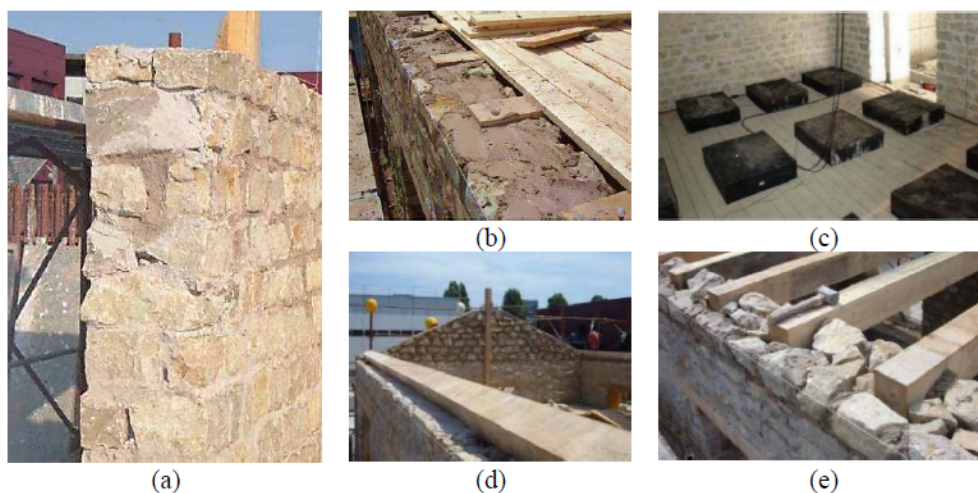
Building 1 details: (a) masonry wall. (b,c) timber floor. (d,e) timber roof Magenes et al. (2010), Guido Magenes et al. (2014), Senaldi et al. (2014), and Andrea Penna et al. (2016).
